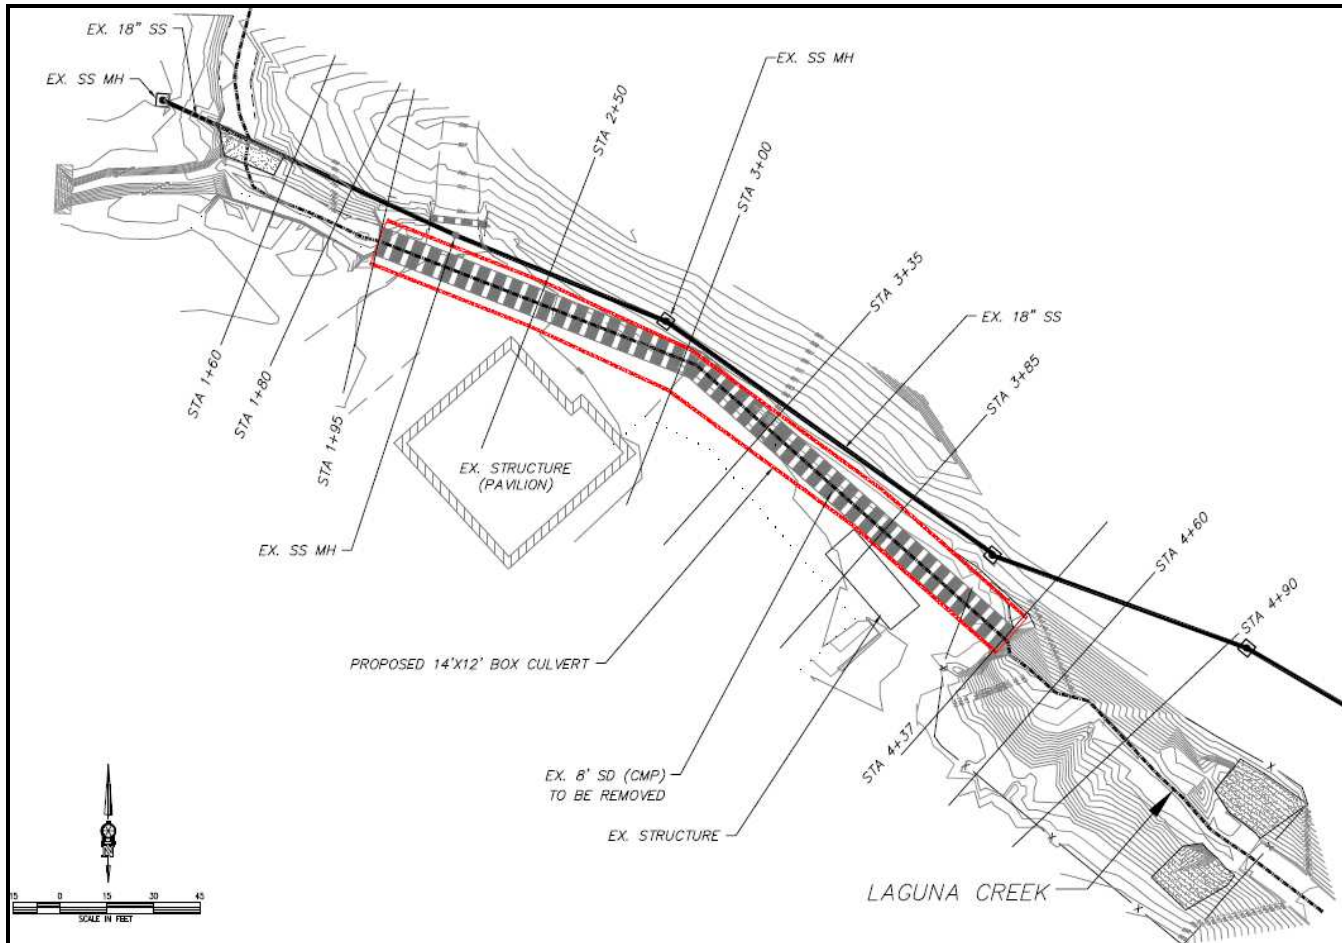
Plan for Alternative 5 – Replace Existing Culvert with 14-ft by 12-ft RCB Culvert
